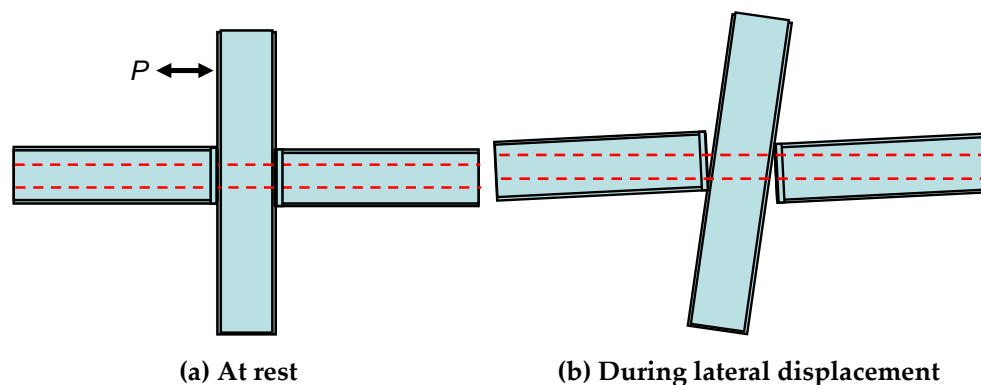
Post-tensioned beam-column joint, showing frame elongation.
